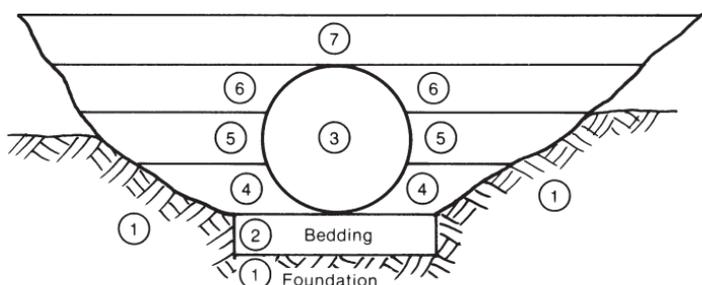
Typical inspector's document for construction control of large corrugated steel pipe structures.
